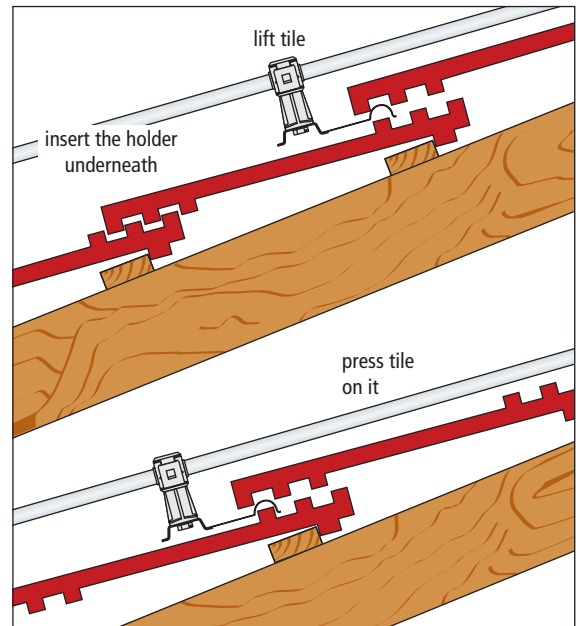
Roof conductor holder for hanging into the bottom seam of pantile roofs
